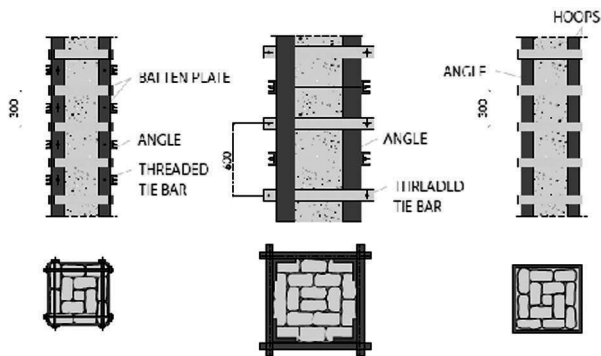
Steel jacking of masonry columns [Mazzolani, 2008].
